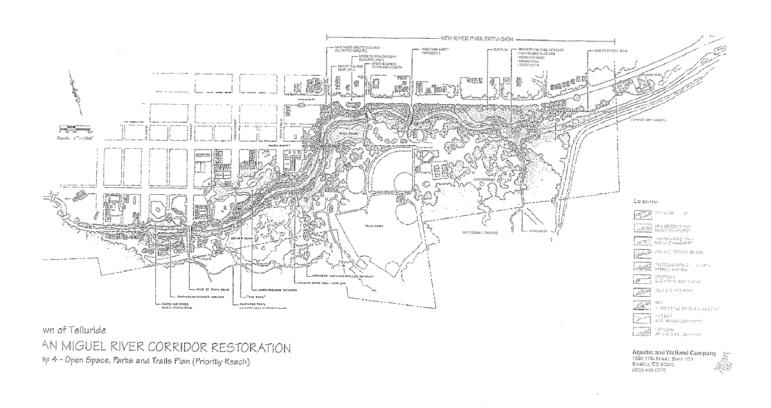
Open Spaces, Parks and Trails Plan (From 1998 San Miguel River Corridor Restoration Plan).
